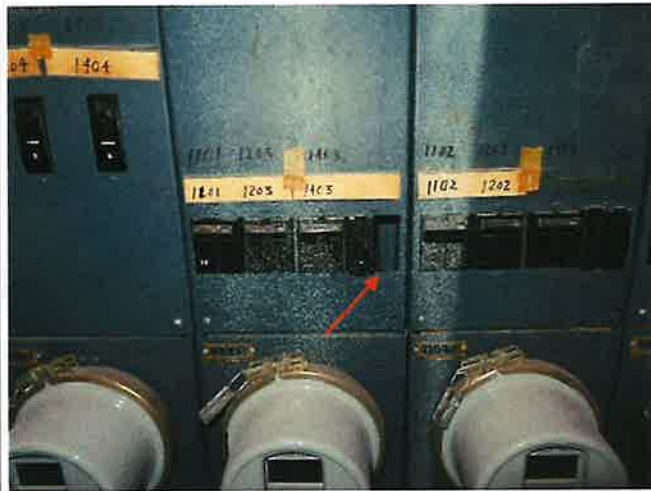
North building, tower 4, meter room level 12: opening in circuit breaker space.
